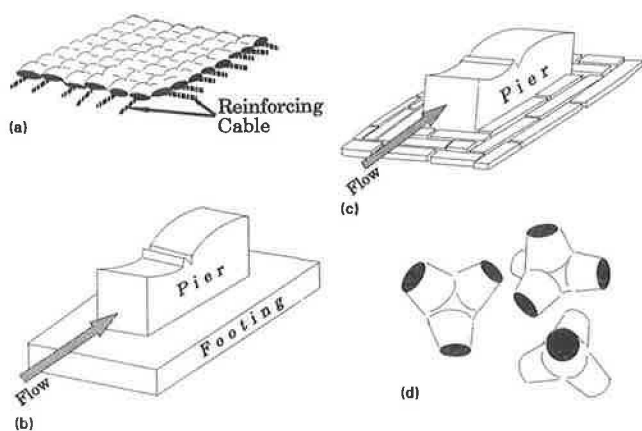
Alternative protective materials: (a) grout-filled mat, (b) footing, (c) grout bags, (d) tetrapods.
